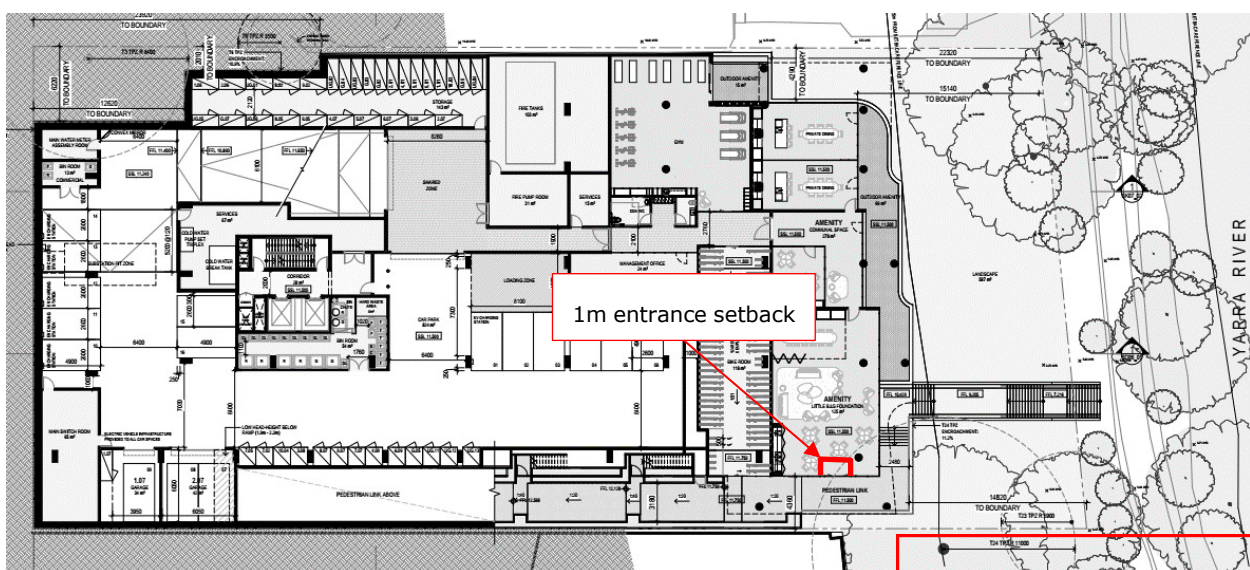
Recommendations for wind amelioration overlaid on the Lower Ground floor plan.
